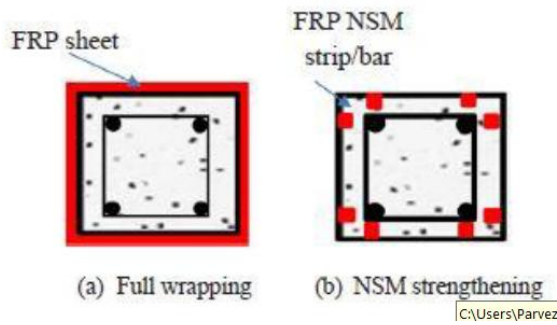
Full wrapping of column and NSM strip for axial strengthening
